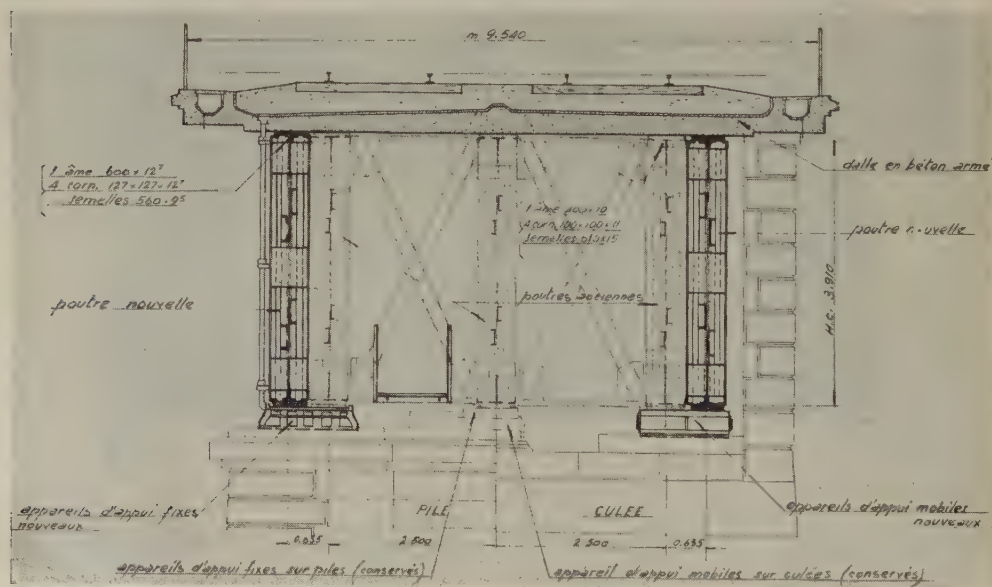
S.N.C.F. : Bridge over the Lot at C apdenac. — (2 end spans of 41.873 m and 1 central span of 46.666 m). — Reinforcement of the metal deck and addition of reinforced concrete decking.
